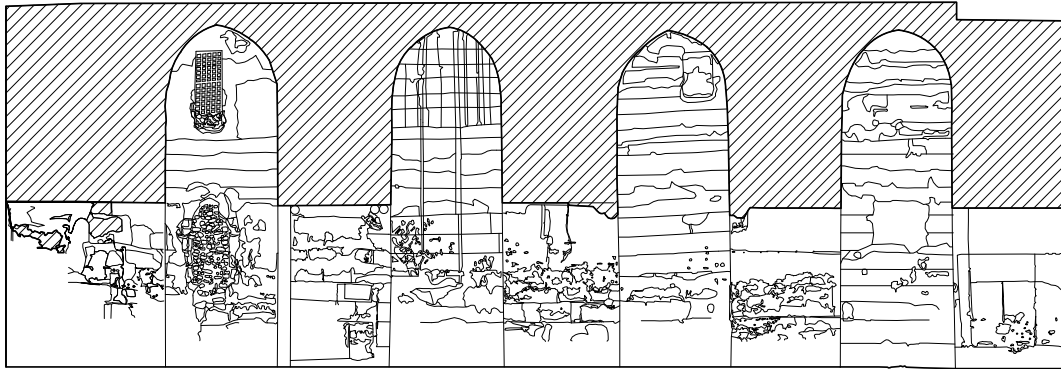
Eastern internal façade of the tunnel vaulted niches and the lower sections of the five piers between them
